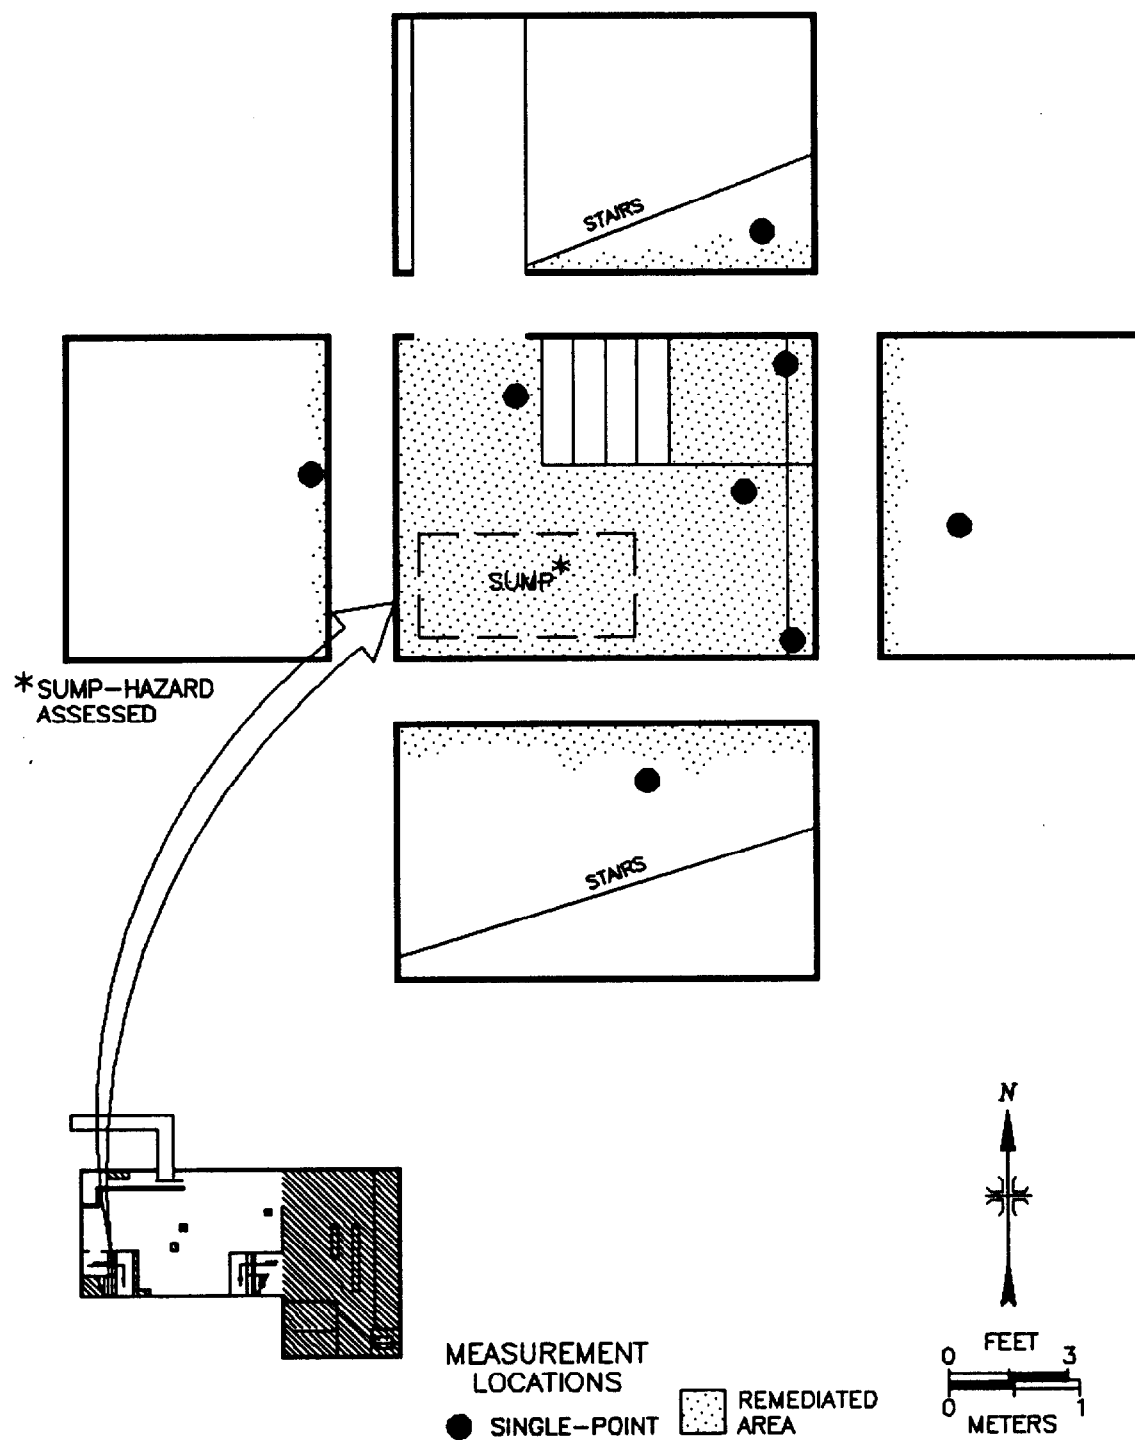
Building 23, Basement, Southwest Stairwell – Remediated Areas and Measurement Locations
